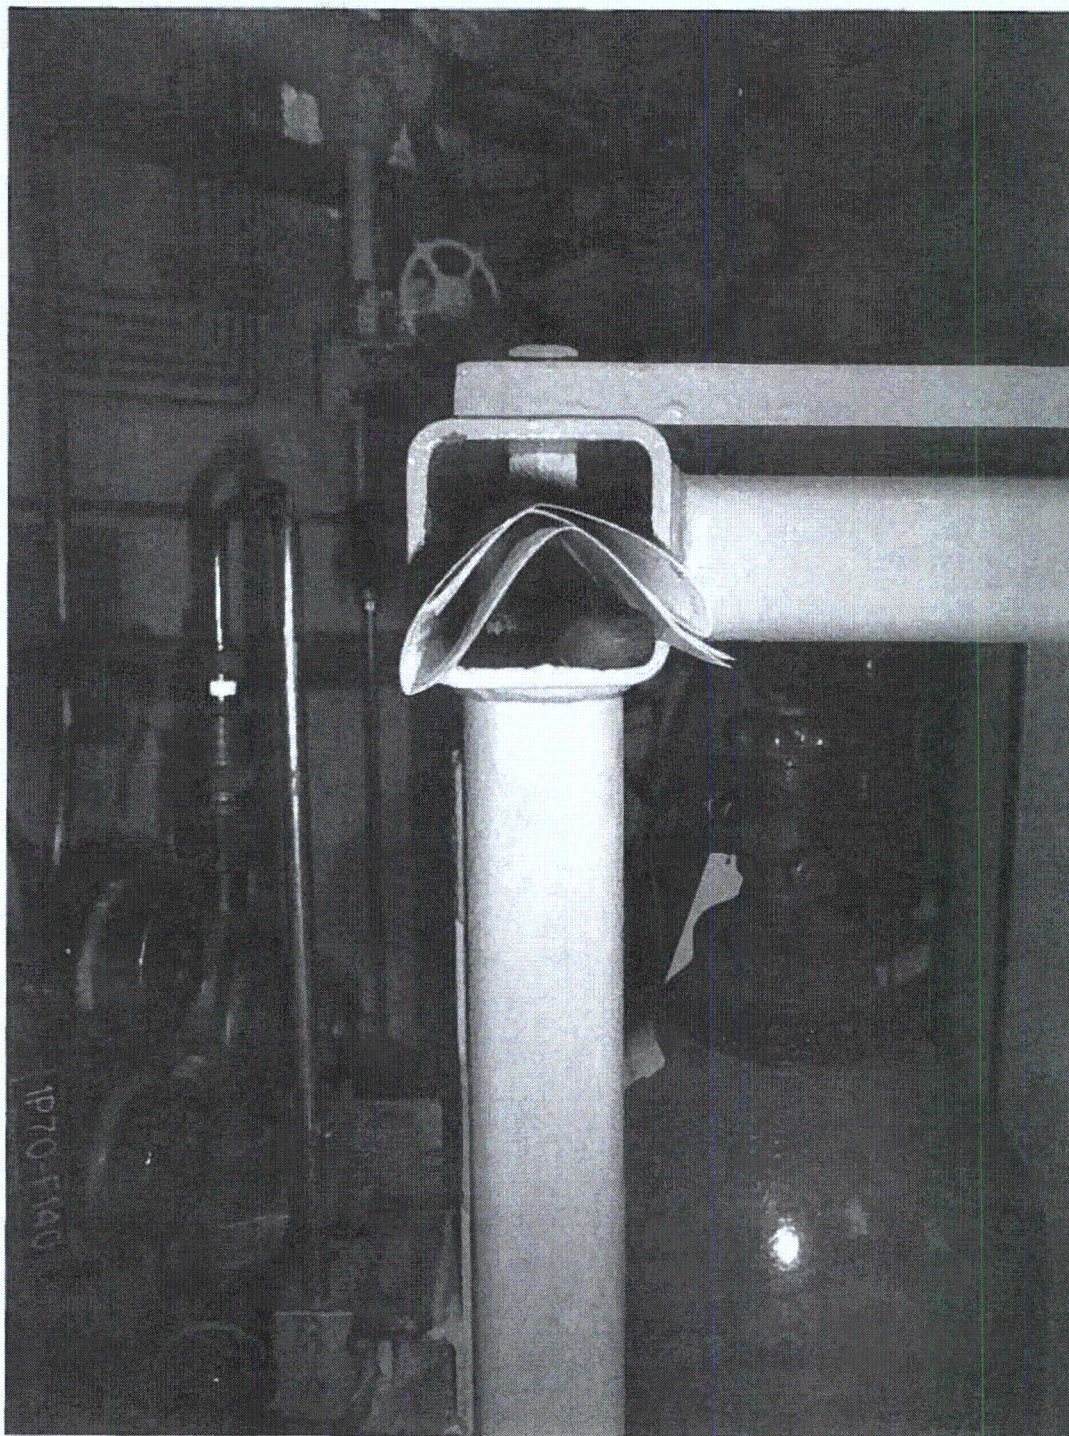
Tool and Paper in Top Tube Steel Horizontal (1P70-A002B)
